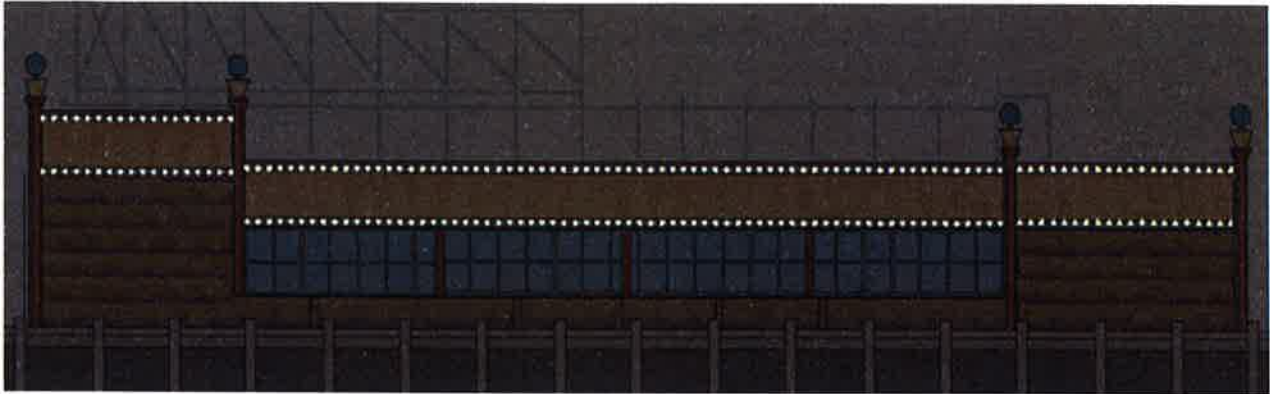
Lighting proposed for west elevation (Source: Applicant's architectural drawings)
